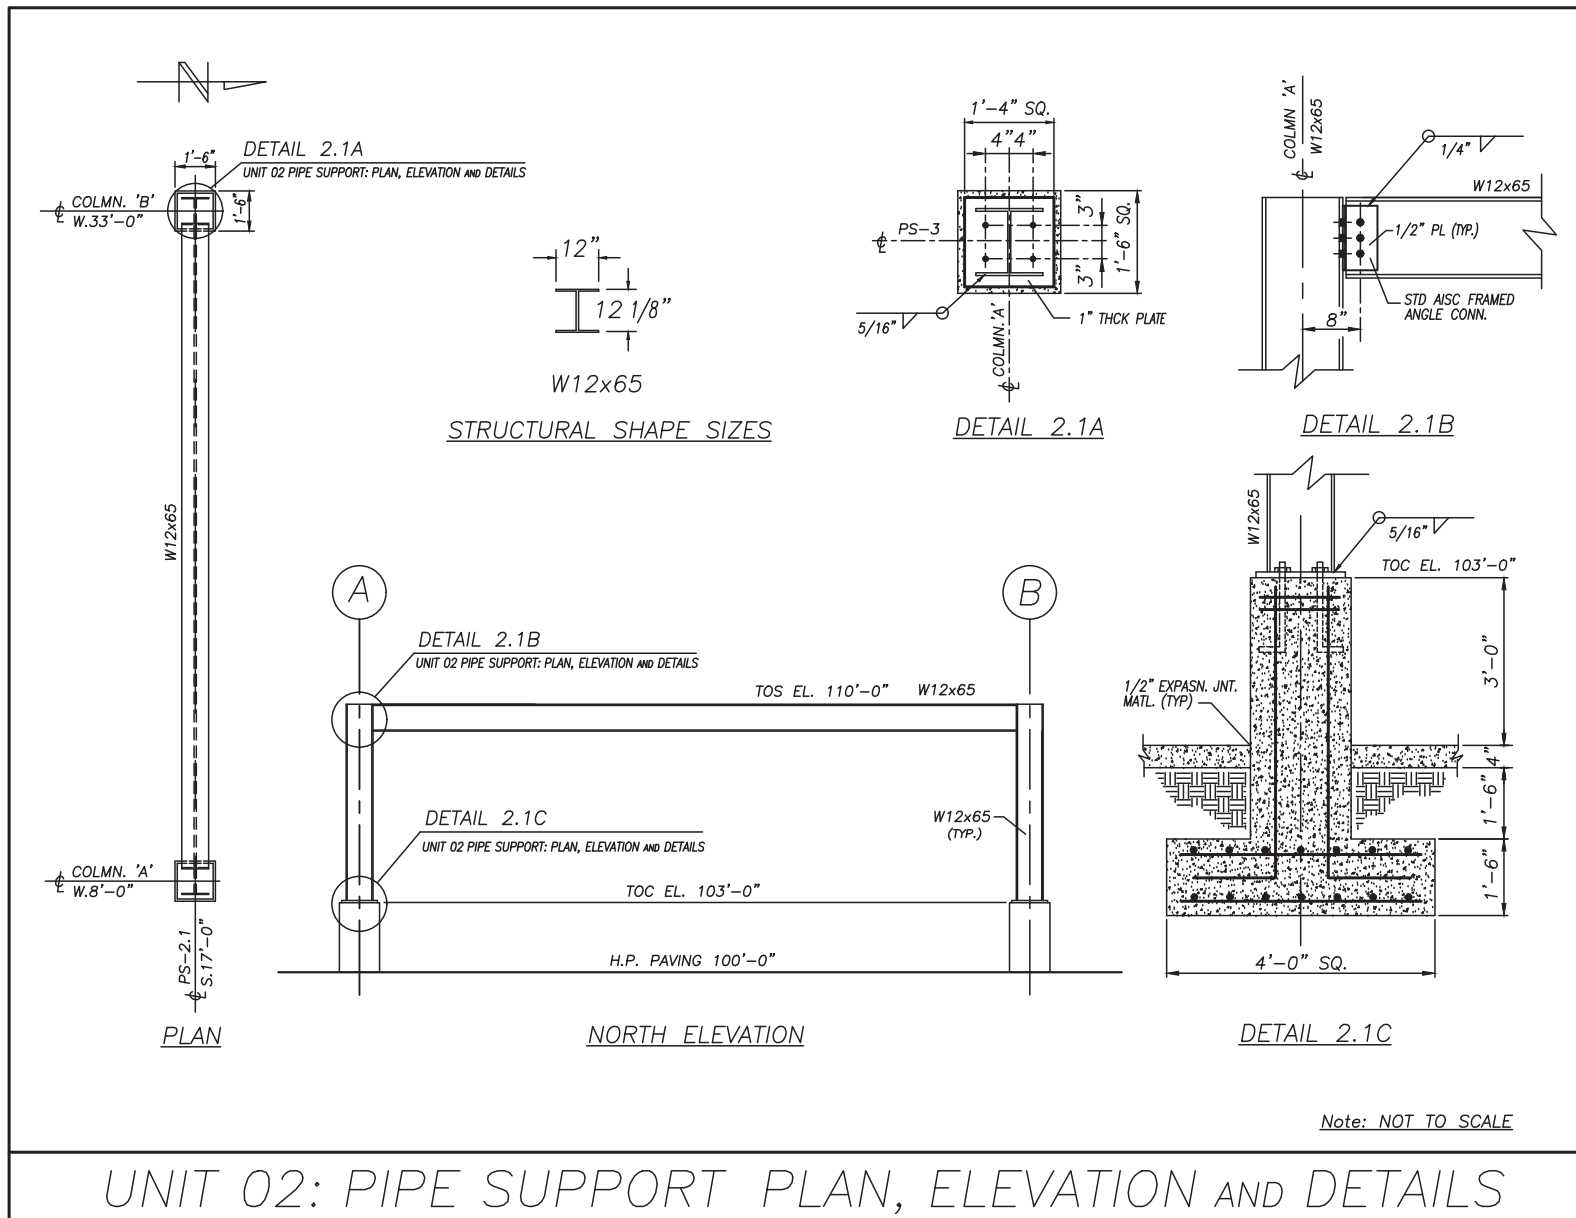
Unit-02: Pipe Support Plan, Elevations, and Details.
